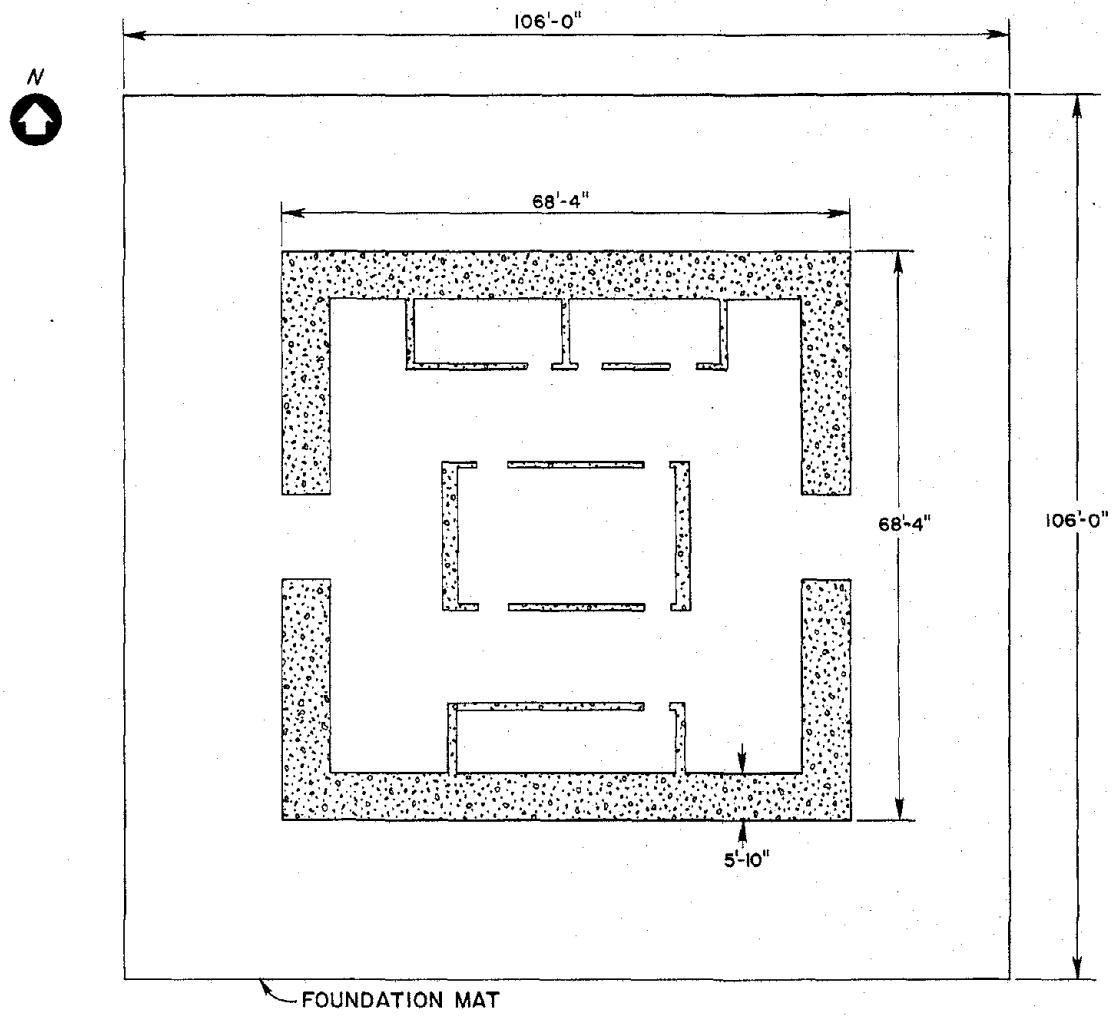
FLOOR PLAN AT BASEMENT LEVEL
